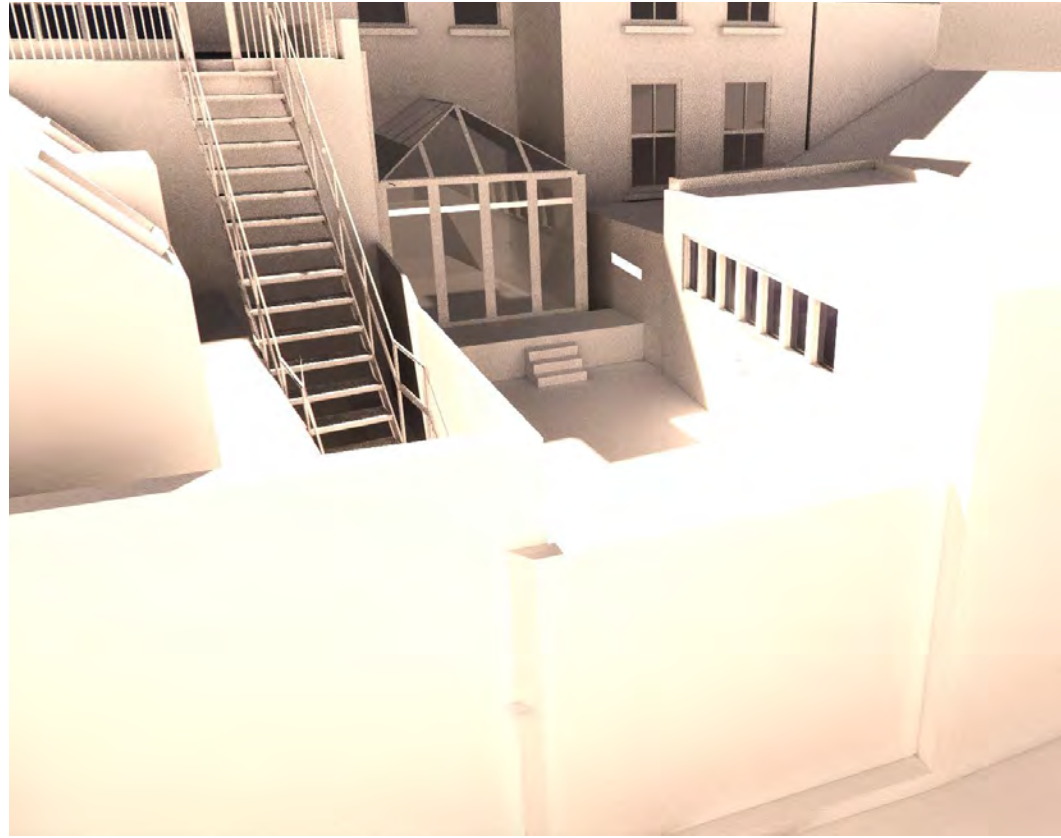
Rear first-floor windows to the North (No 74 Heath Street) are opaque-glazed.
